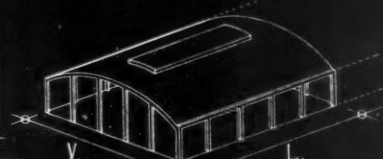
A: BEAM &amp; COLUMN WITH TOP LIGHTING.
